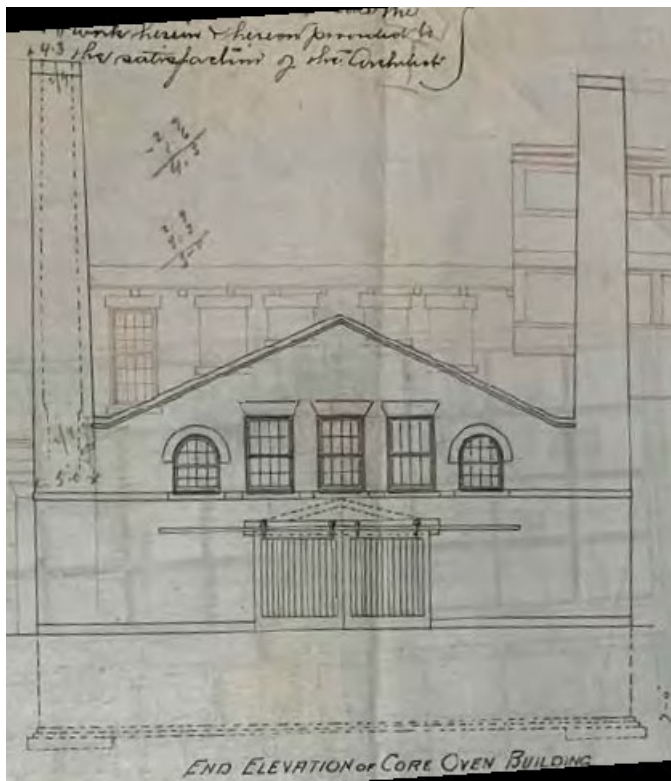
1900 original drawing by EJ Lennox for the Core Oven Building, east elevation (EJ Lennox Fonds, Archives of Ontario)
